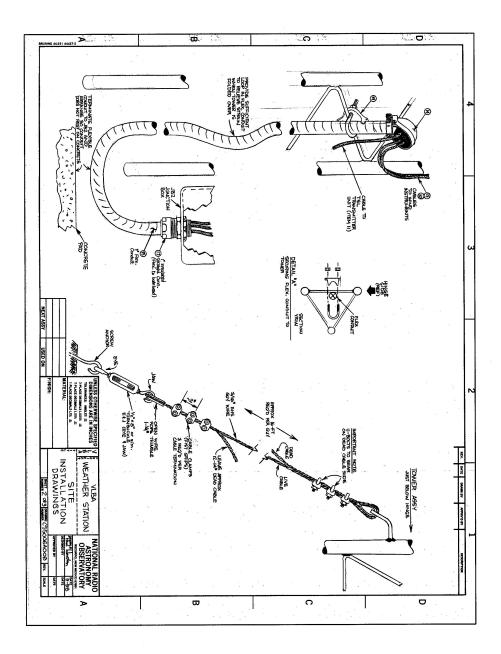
VLBA Weather Station Site Installation Drawings, C55006A008-2
